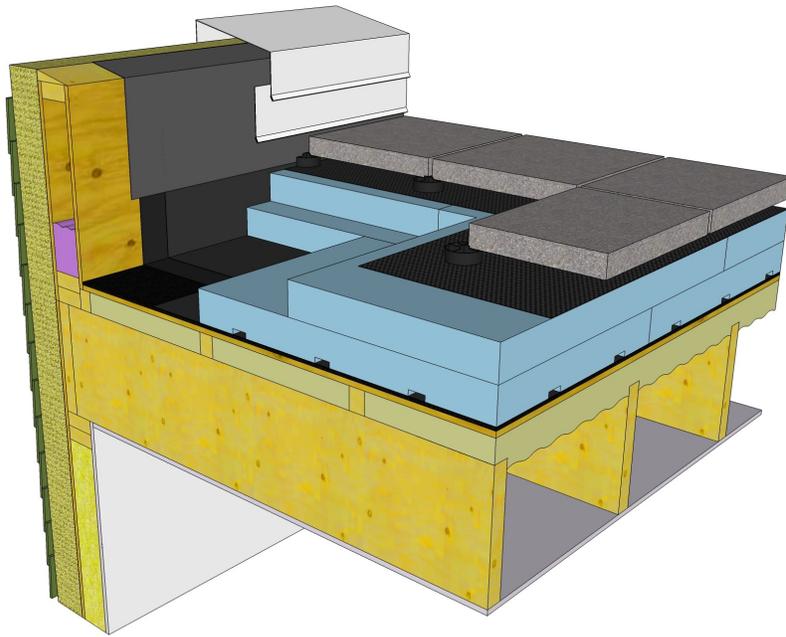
Low Slope Roof With Inverted (Protected Membrane) Roof Assembly
